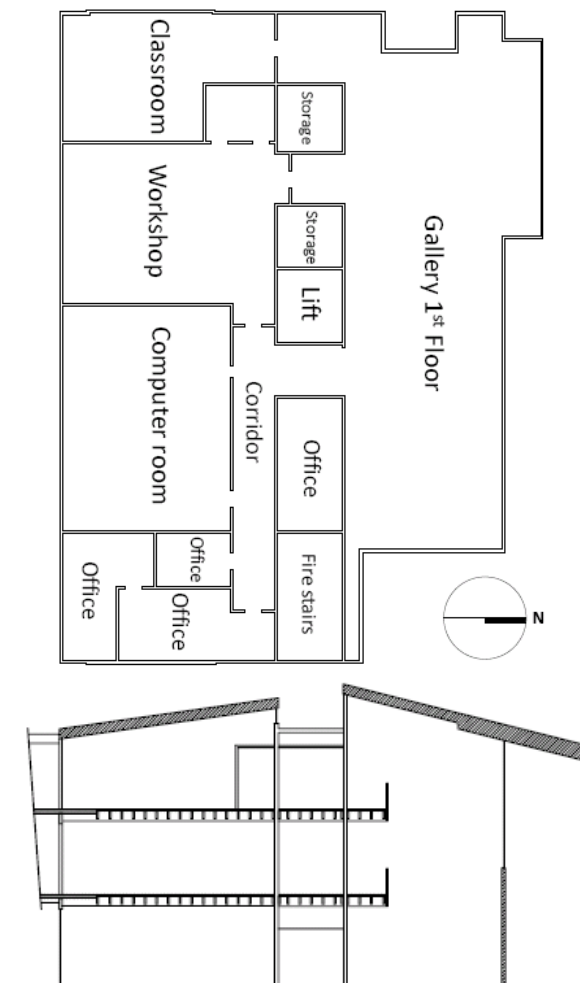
Plan of level 1 and cross section of the Arts and Media building
